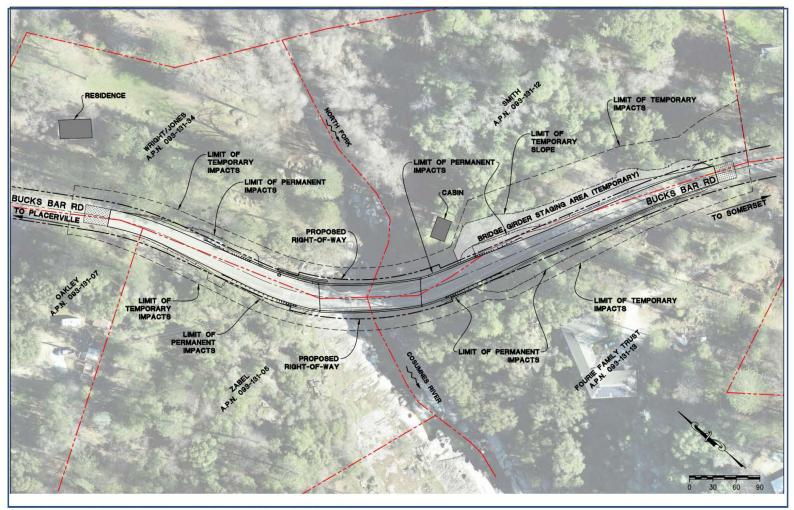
Plan View of Proposed Project on Bucks Bar Road
